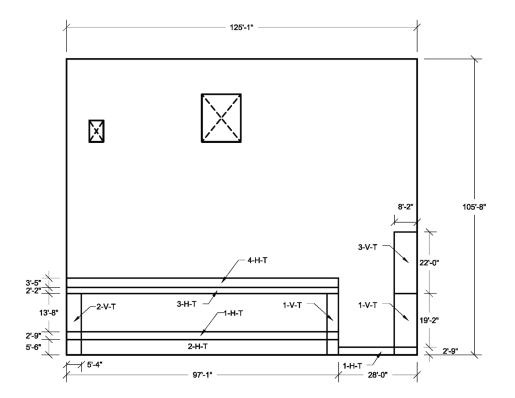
H.3-22 East Wall Looking West Transverse Reinforcement Zones
